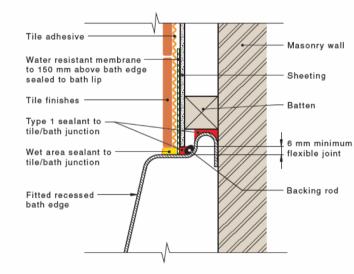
(B) — Bath with no shower over it — Fitted bath — Masonry wall with sheet spaced via battens
